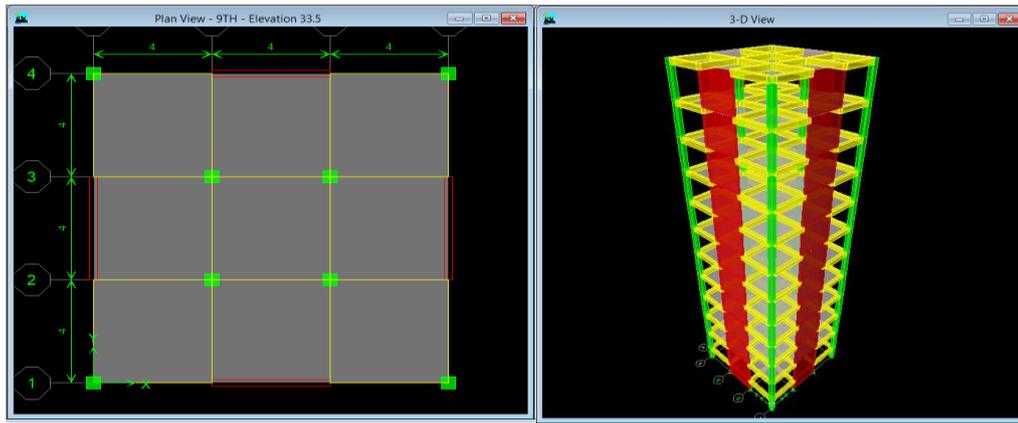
Plan and 3D view of building for R=3 (12m x 12m)
